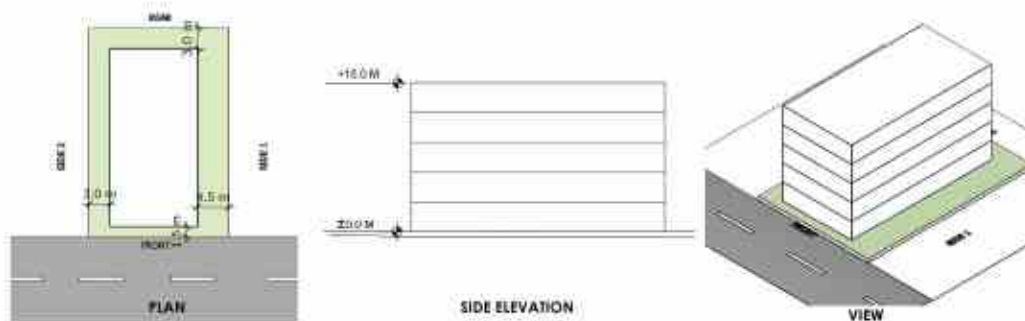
Maximum building envelope for building with height upto 30.00 M.
